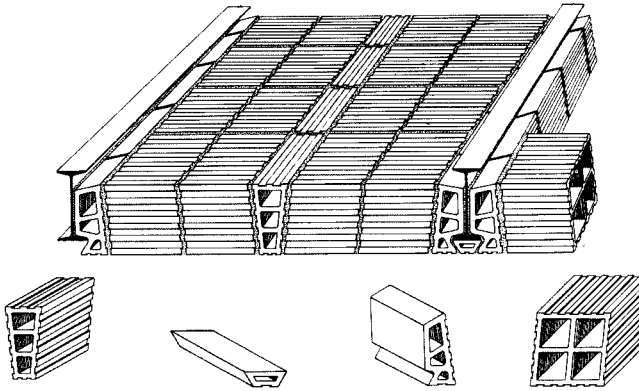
Early twentieth century side pressure, hollow tile floor arch which was rapidly becoming obsolete (from Hollow Building Tile Association, Handbook of Hollow Building Tile Construction, 78)
